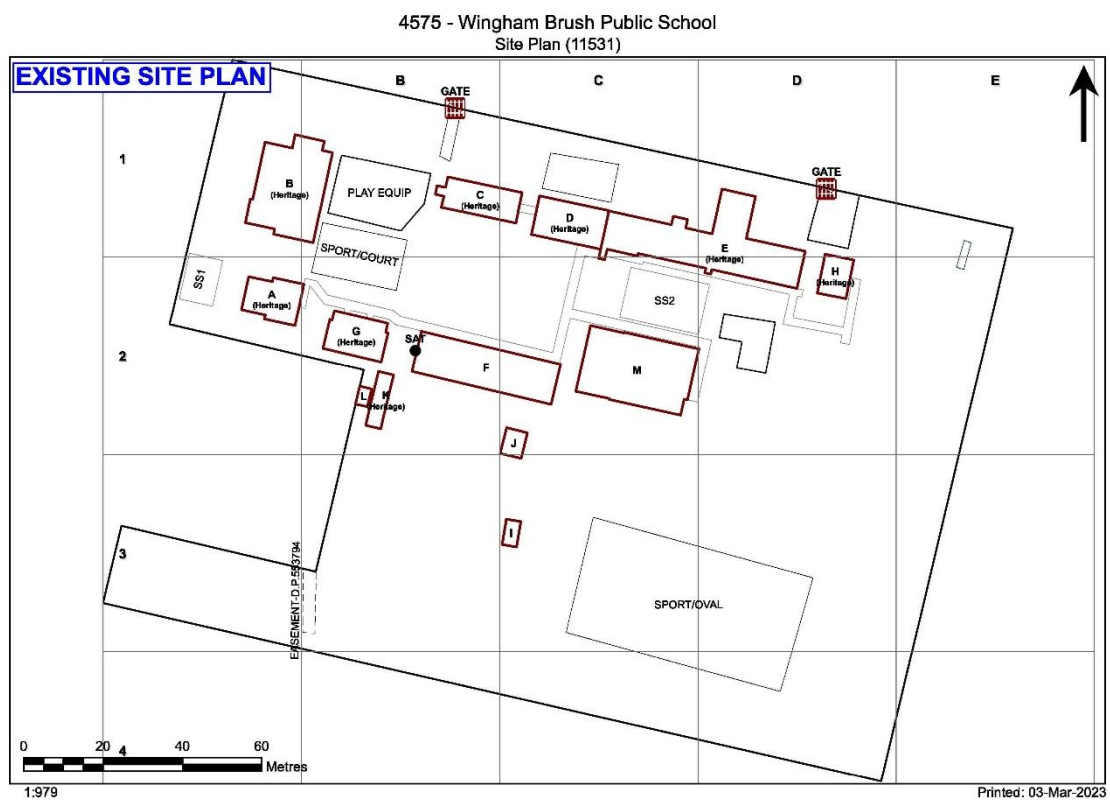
Existing site plan showing heritage buildings within the Project Area. (Source: SINSW, Site Plan 11531)
